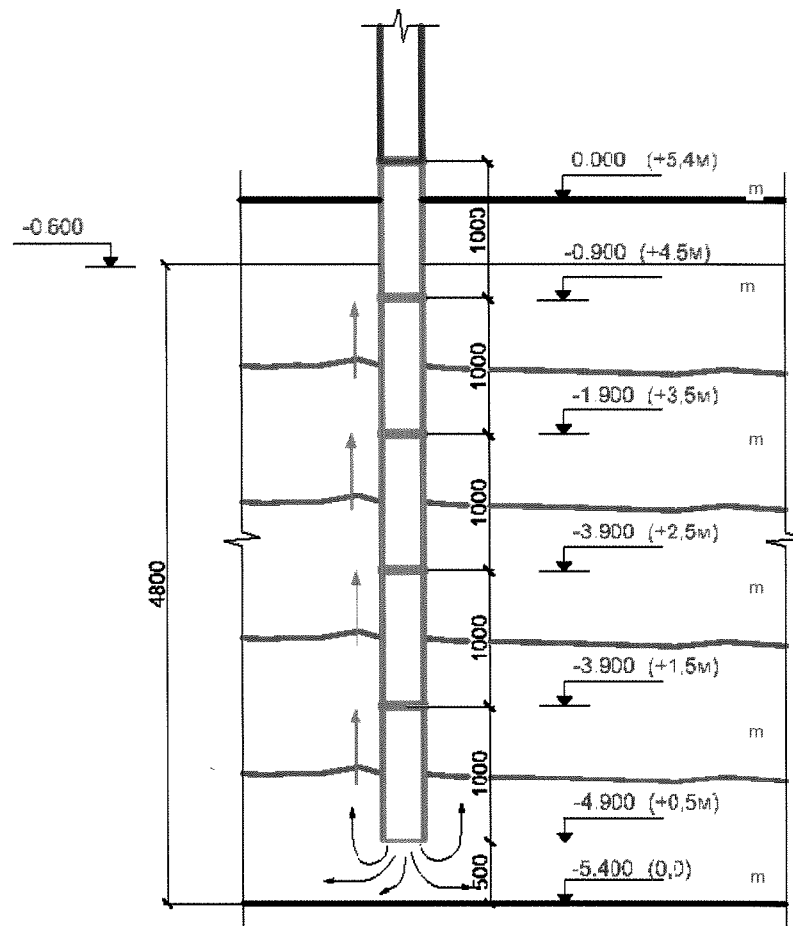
Removable elephant trunks for concrete mix delivery into concreting section
